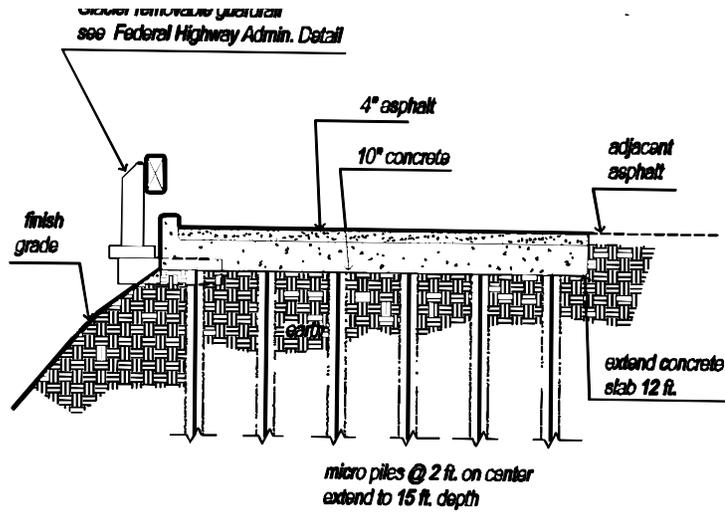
Installation of removable guardrail on concrete slab, anchored with micropiles
